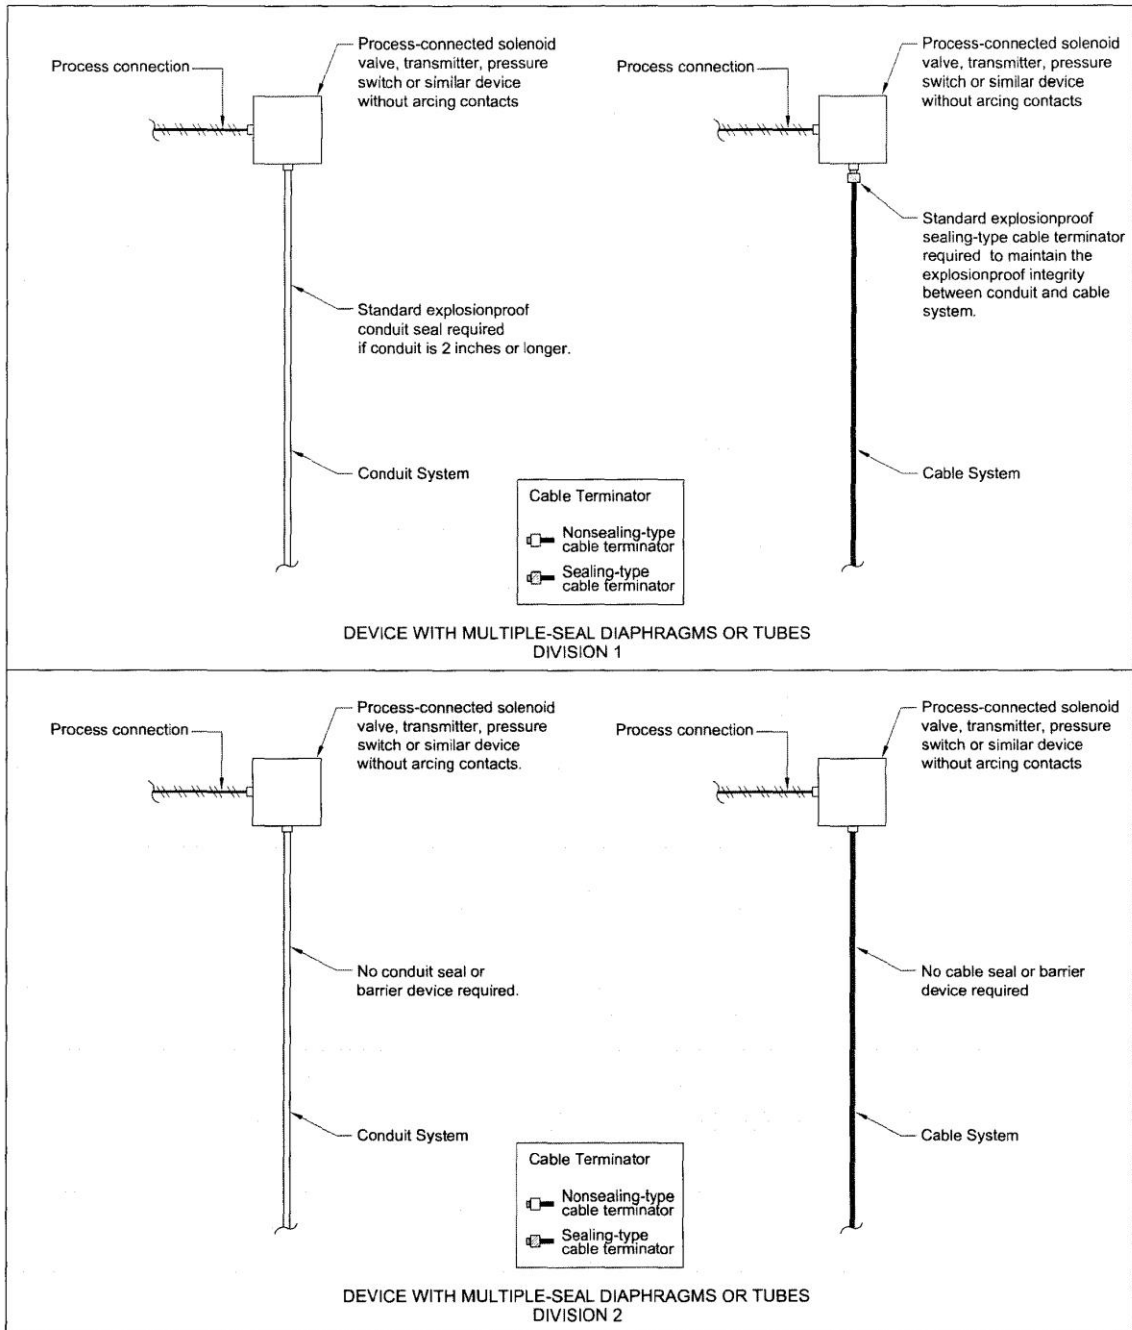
Typical Class 1, Division 1 or Division 2 Electrical Installation Conduit and Cable Connections to Process-connected Nonarcing Devices with Multiple Seal Diaphragms or Tubes
